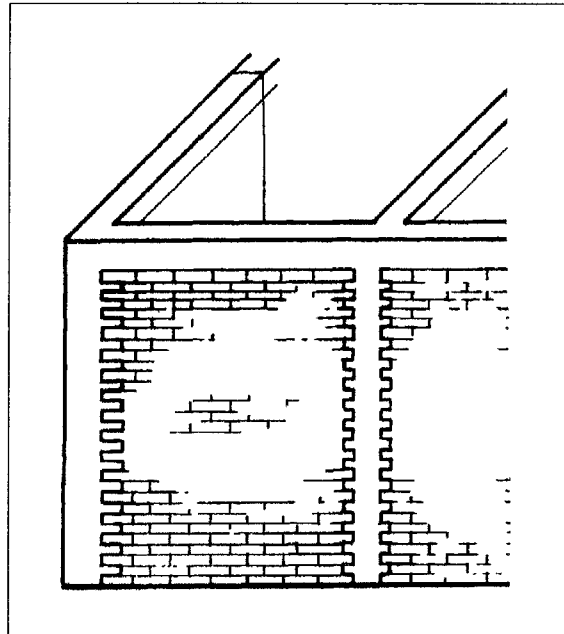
shows a similar system, developed by the University of the Andes, Mérida, Venezuela. The blocks have grooves and tongues which interlock. Horizontal ring beams of reinforced concrete are placed at a height of 1.20 m and on top of the wall.
